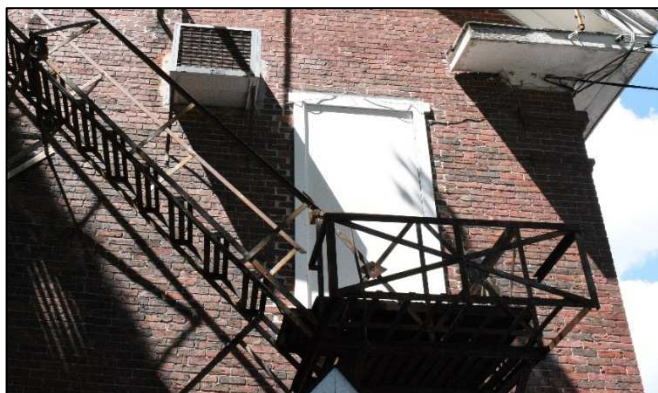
2nd floor egress, east elevation Ashland Town Hall.
